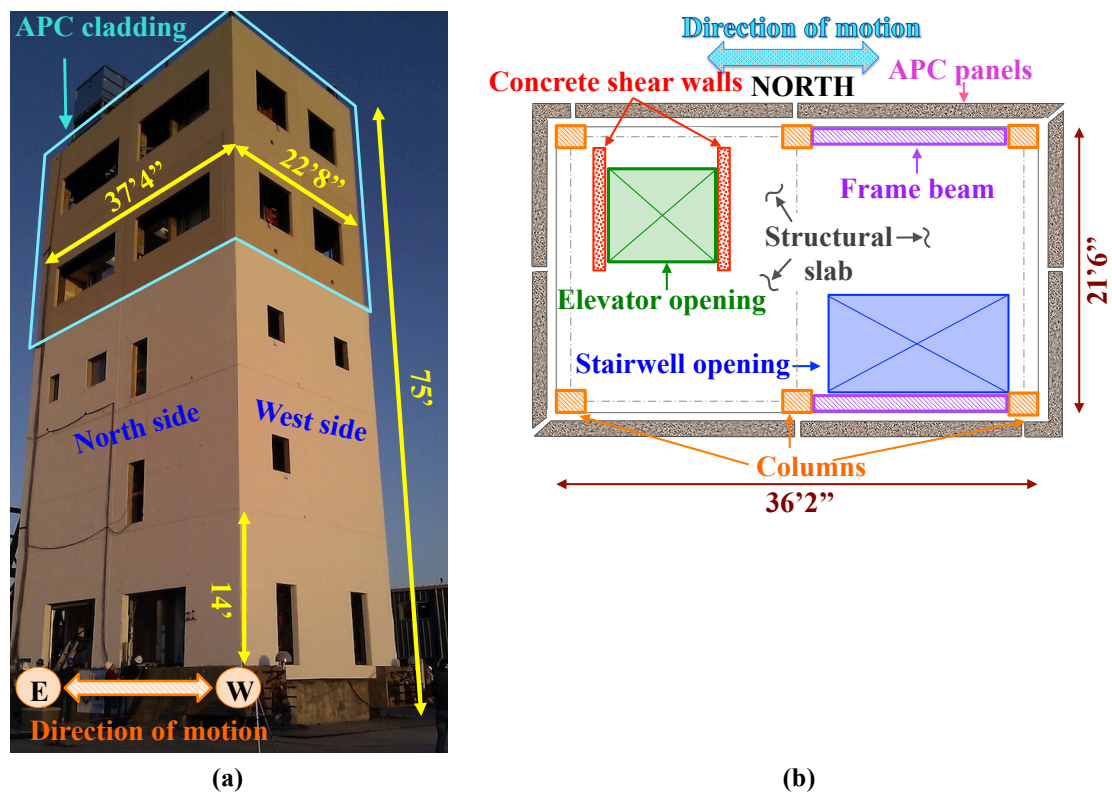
BNCS building: (a) picture from the northwest corner, and (b) plan view of a typical floor
